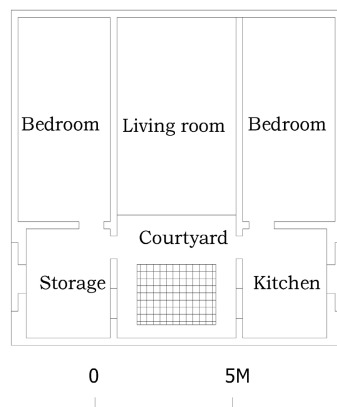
Floor plan of a single-storey *sanjian lianglang* house. Based on Gu *et al.*, 2008, p. 100.
